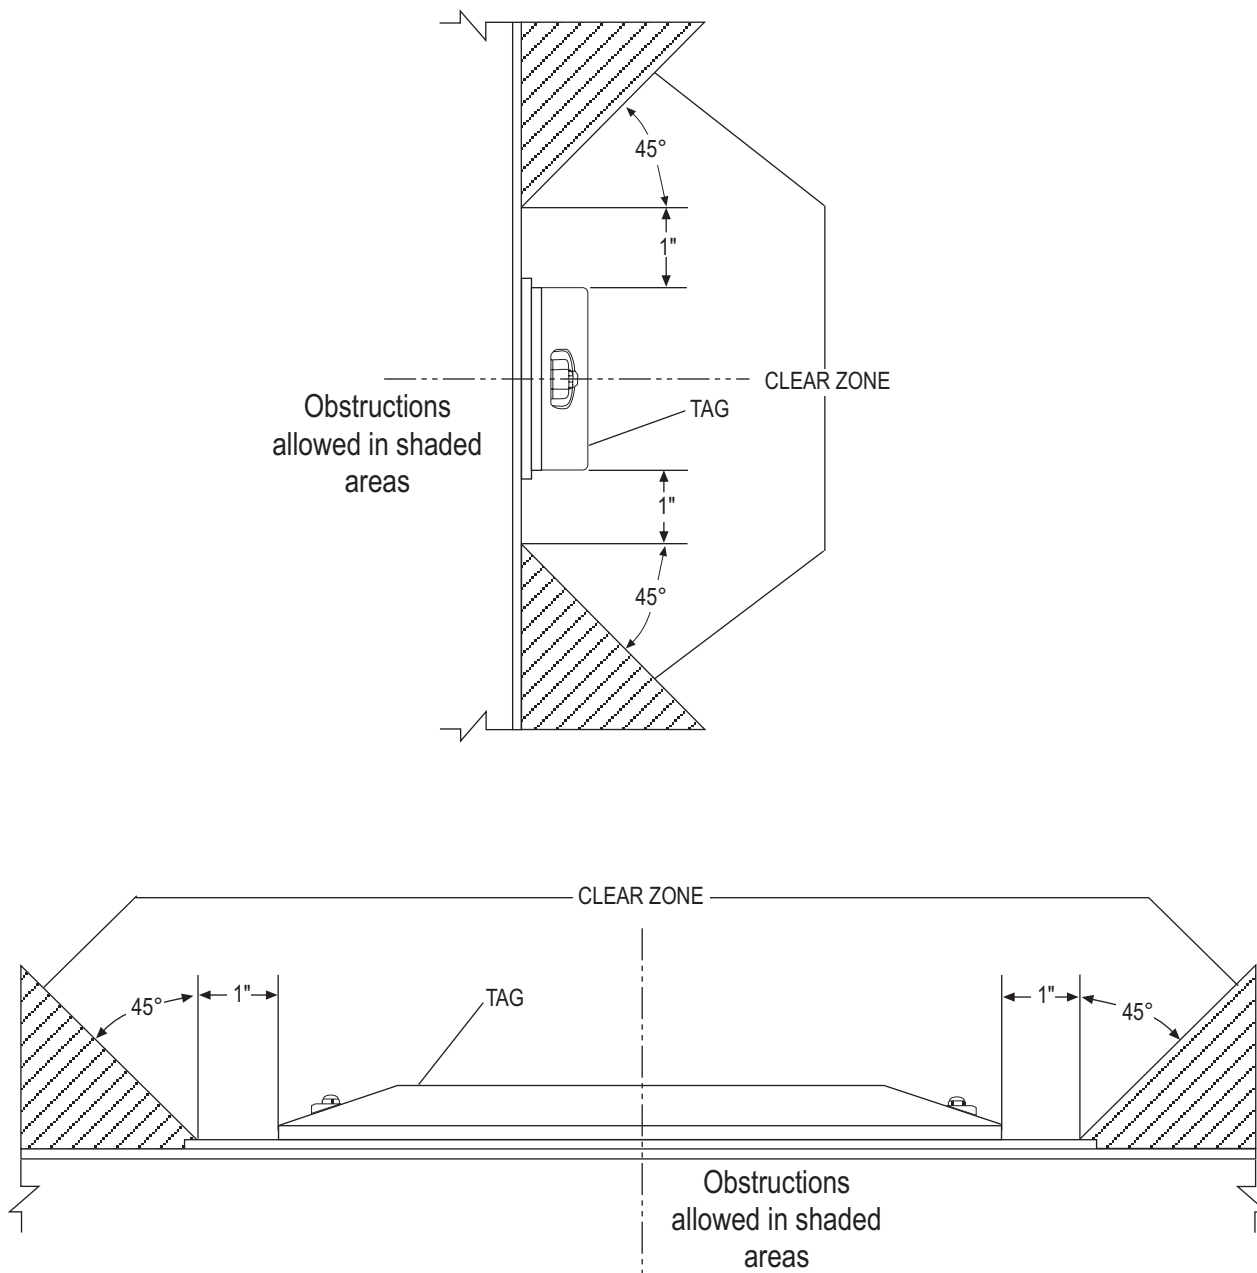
Tag mounting clearance zone battery-powered tags
